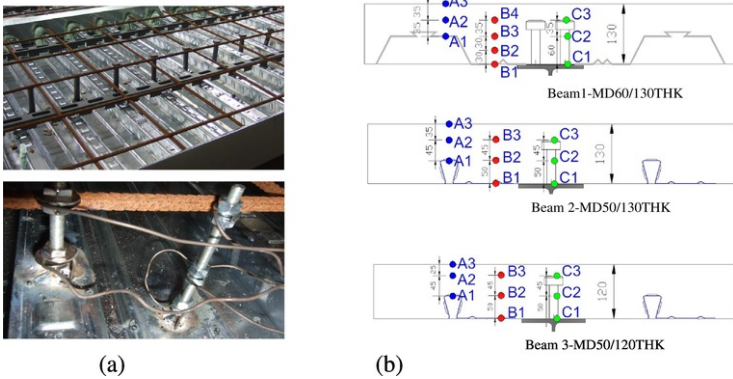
Slab thermocouple locations: a) decking photo, b) detailing positions.
